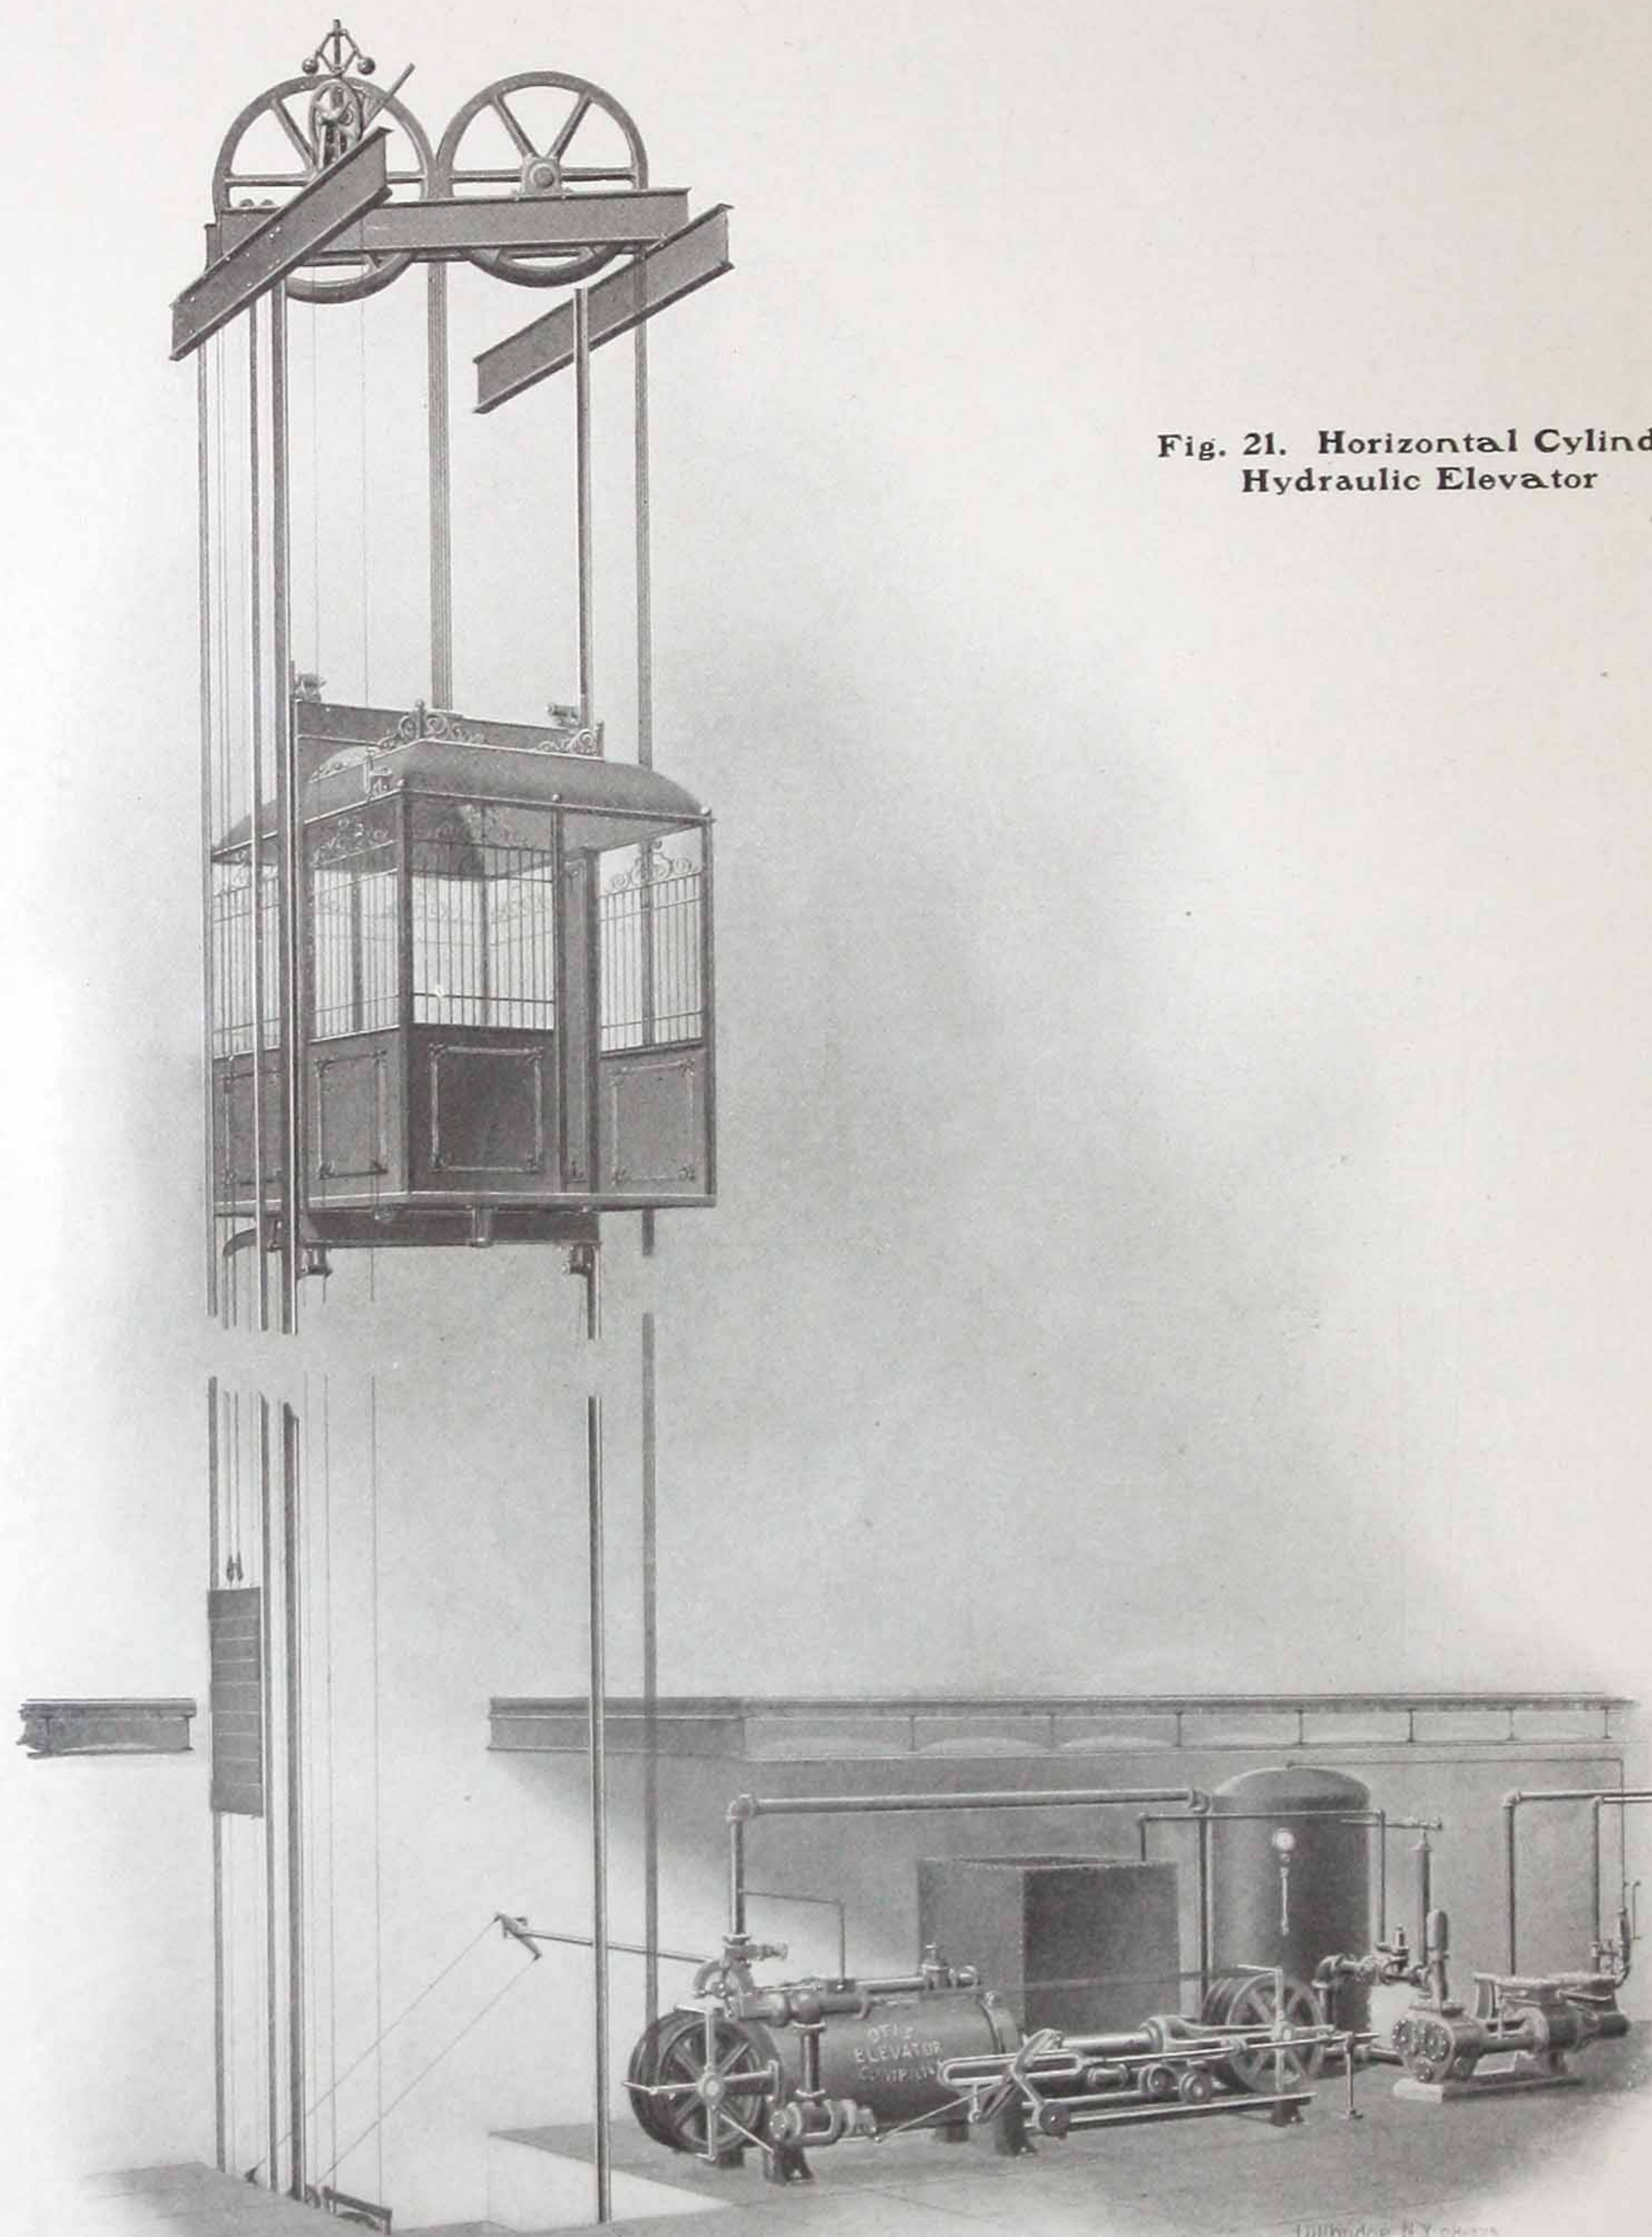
Horizontal Cylinder Hydraulic Elevator
